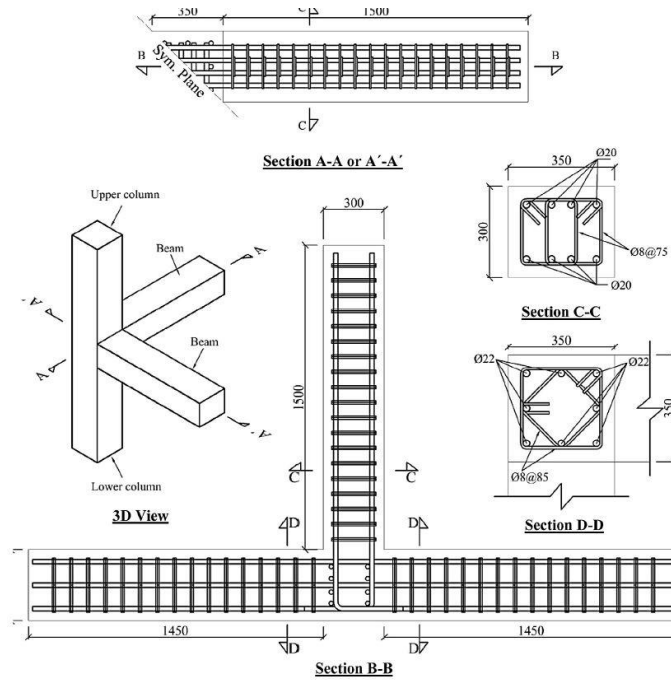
Dimensions and reinforcement details of the specimens (Esmaeeli et al. 2017)
